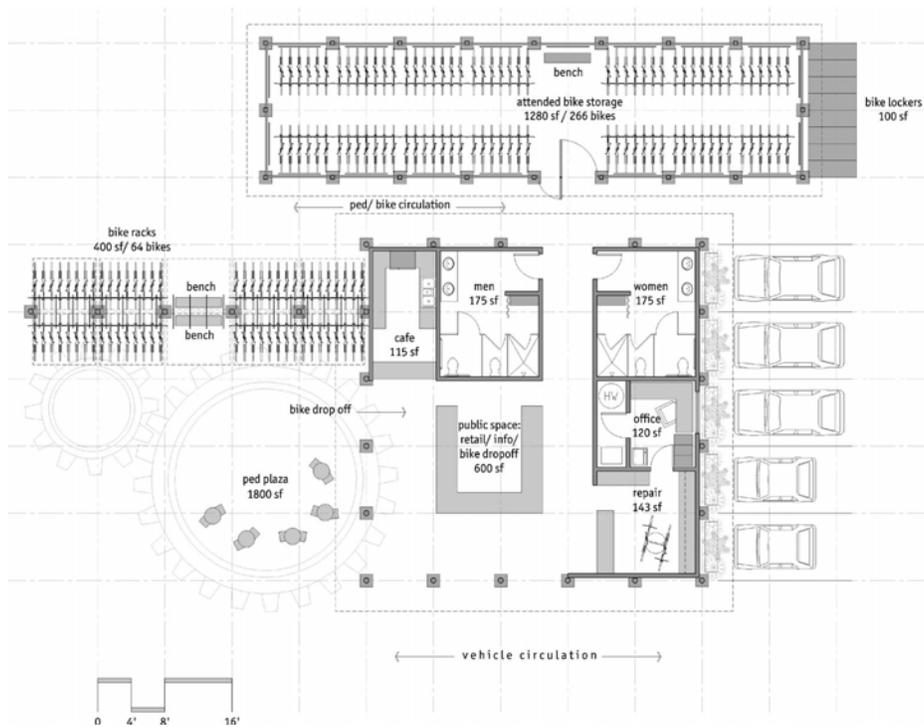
Example Floor Plan of a Full-Service Bike Depot
